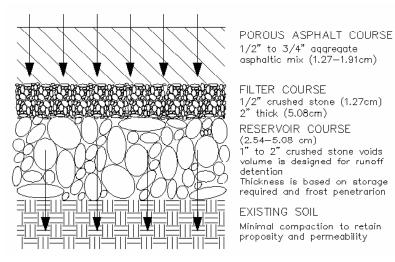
TYPICAL SECTION THROUGH ASPHALT POROUS PAVEMENT
